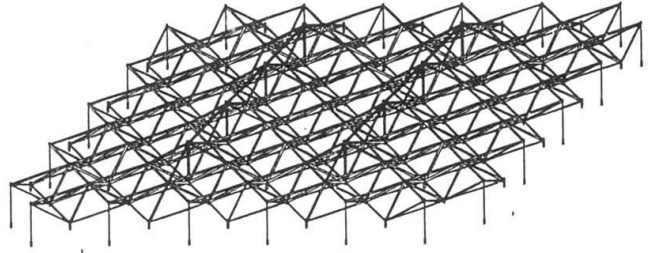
ROOF FRAME - ISOMETRIC VIEW
